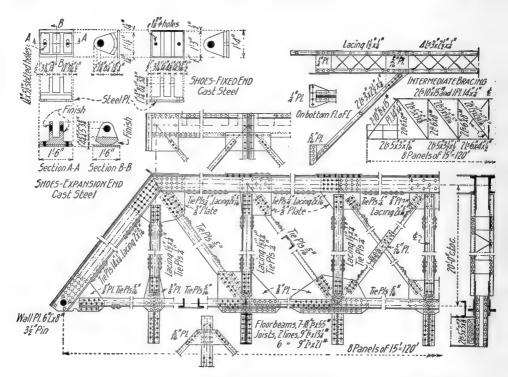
Detail Plans of Through High Truss Span. Wisconsin Highway Commission.
